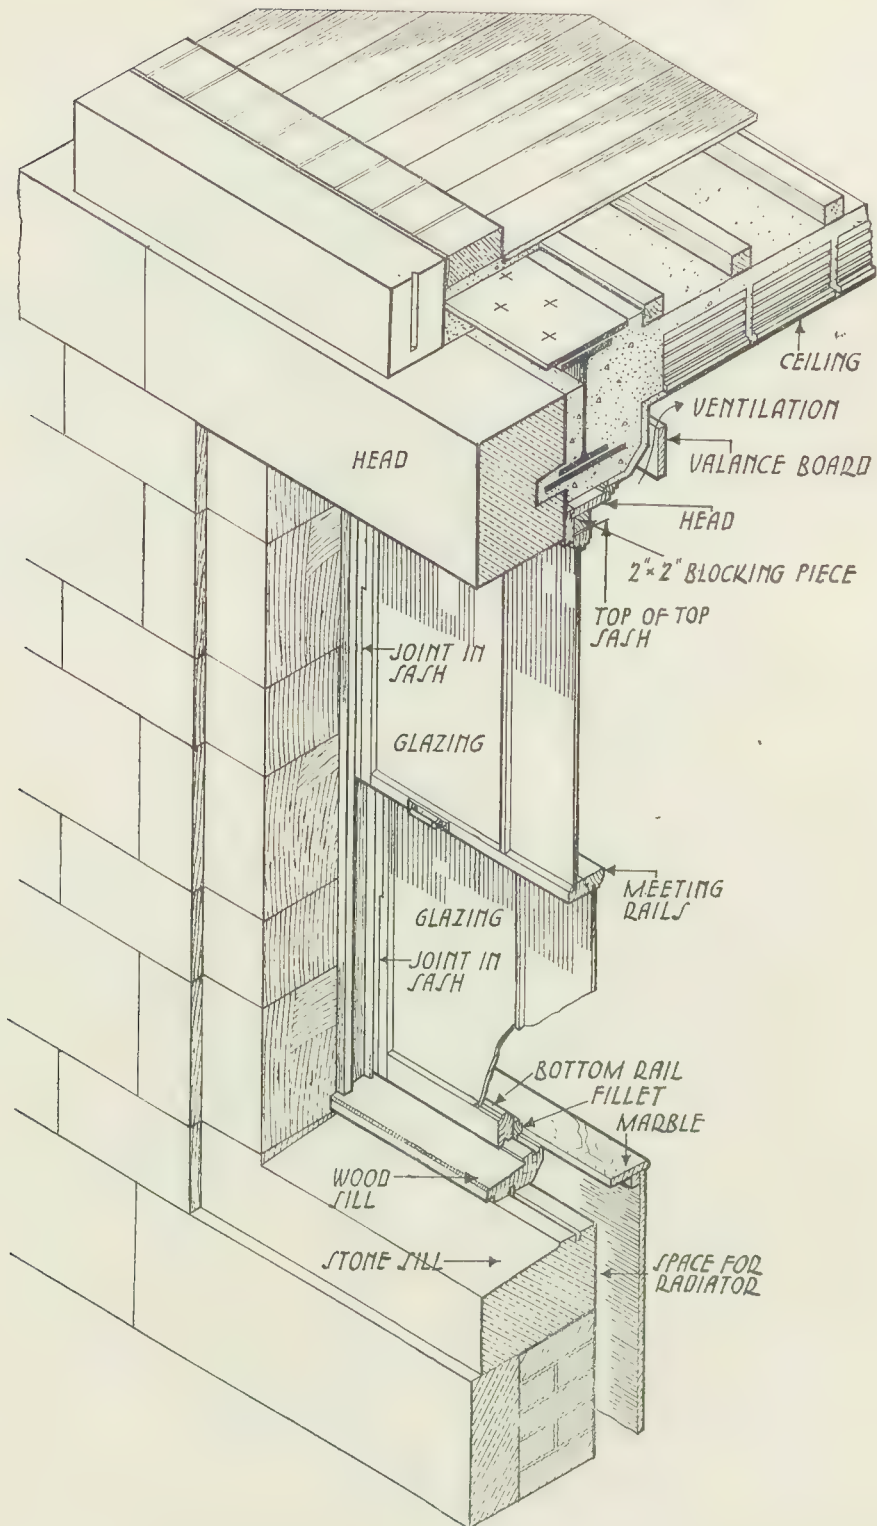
DETAIL OF WINDOW OPENING COMPLETE WITH DOUBLE-HUNG WINDOW FRAME WITH PIVOTED SASHES
